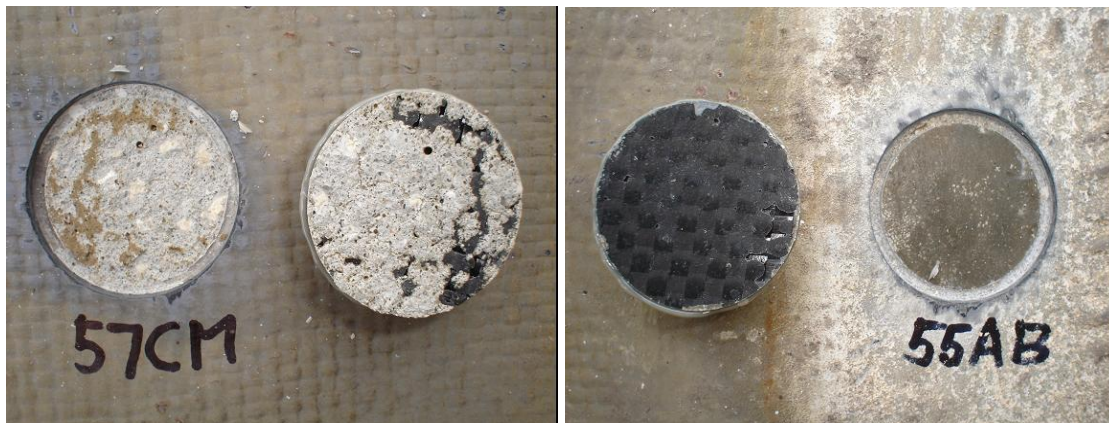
Concrete Failure (L) and Epoxy Failure Between Fiber and Concrete Surface in CFRP Wrapped Specimens (R)
